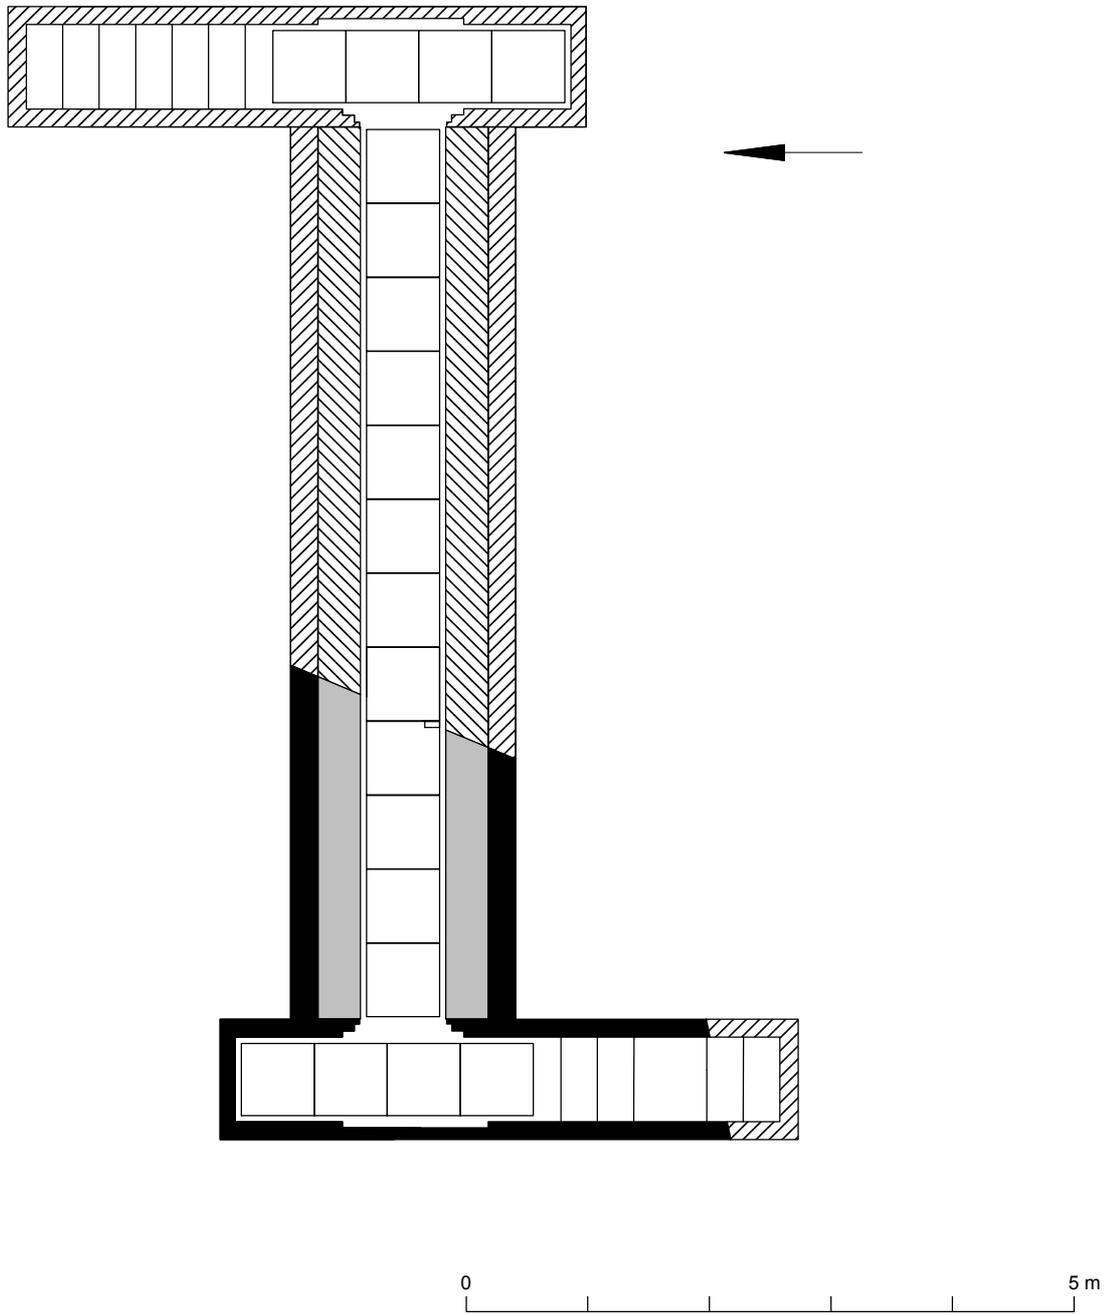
Development Area 7: air-raid shelter WBF84 - plan.
